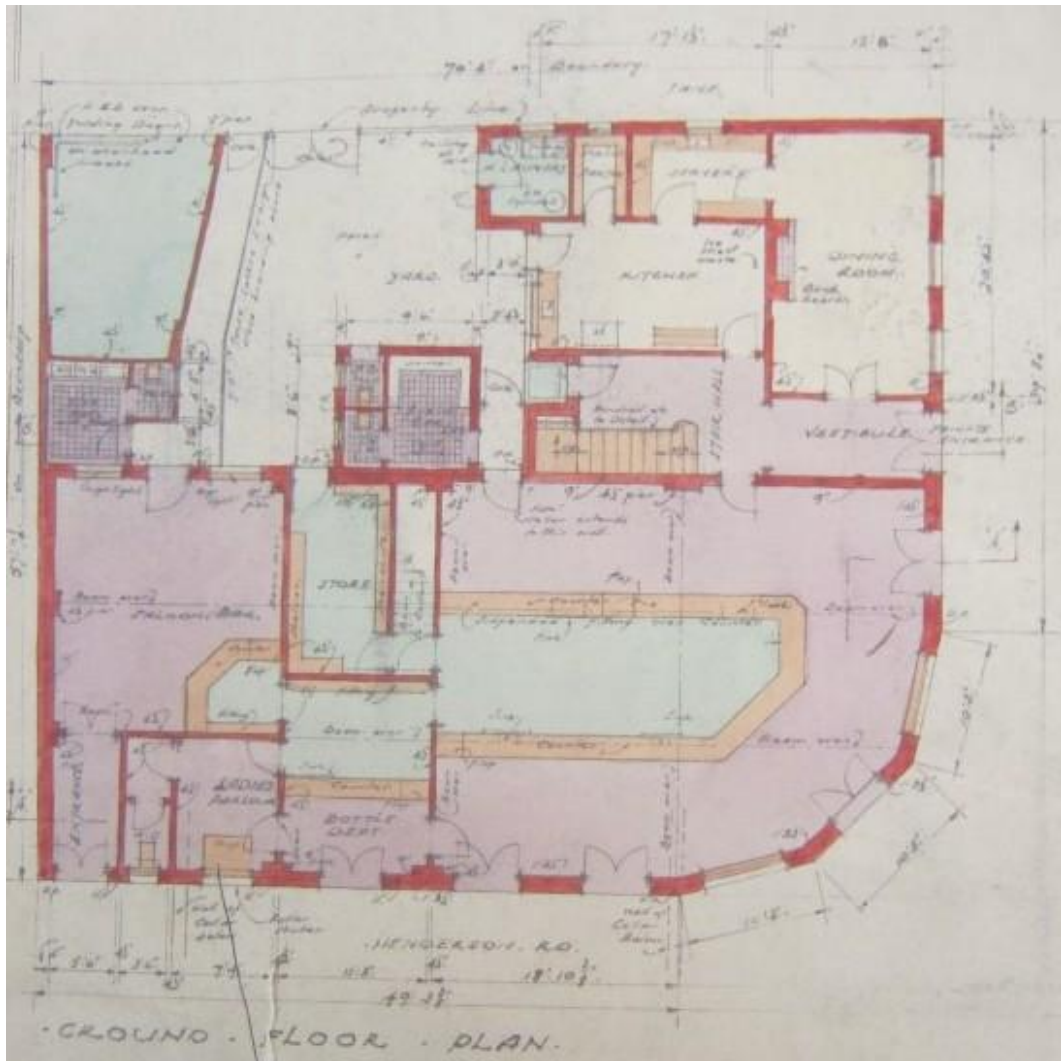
Portion of a drawing prepared in the office of Rudder & Grout during the first half of 1934 describing the ground floor plan of the new Alexandria Hotel. The large public bar contrasts with the smaller saloon bar at the opposite end of the building. Source: State Records AO Plan 69569.
